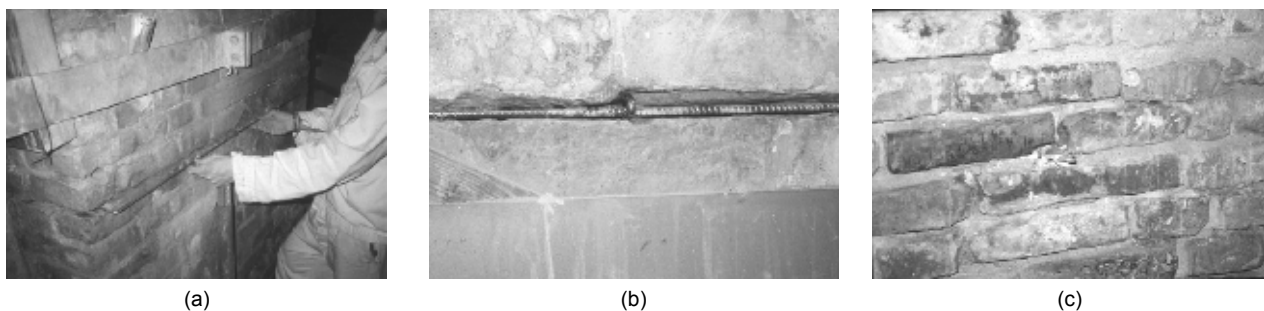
Phases of the repair intervention: (a) insertion of the reinforcement; (b) detail of the wall before repointing, showing the transversal steel tie position; (c) view of the wall after repair, (Binda et al., 1999).
